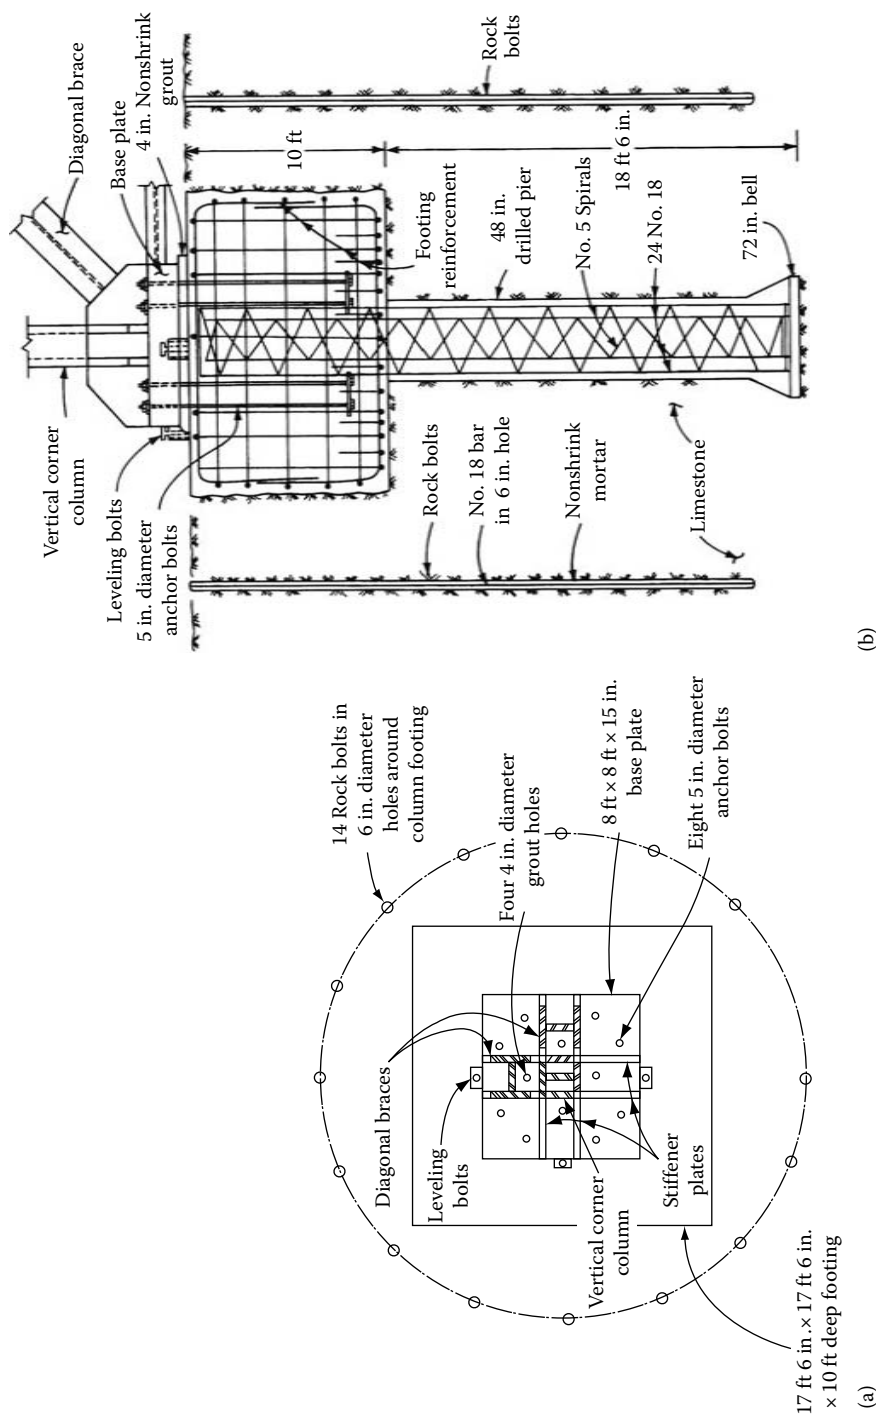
shows the plan and cross section of a foundation system for a corner column of an X-braced tube building. The spread footing founded on limestone resists the compressive forces while the belled pier under the spread footing is designed to resist uplift forces. To guard against the failure of rock due to horizontal fissures a series of rock bolts are installed around the perimeter of spread footing.
